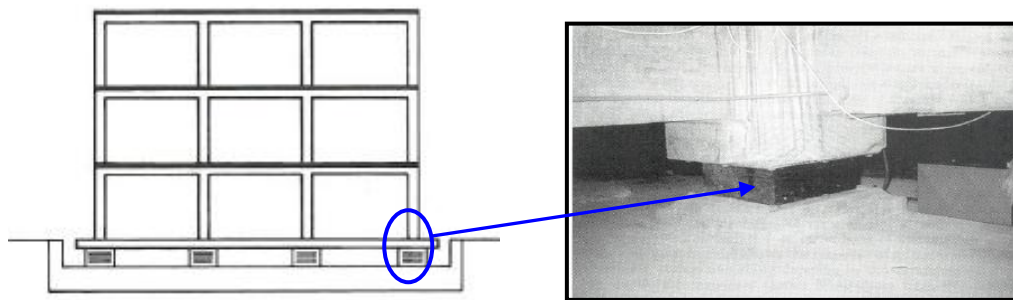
Base Isolated Building with Laminated Rubber Bearing Isolators (Key 1988)
